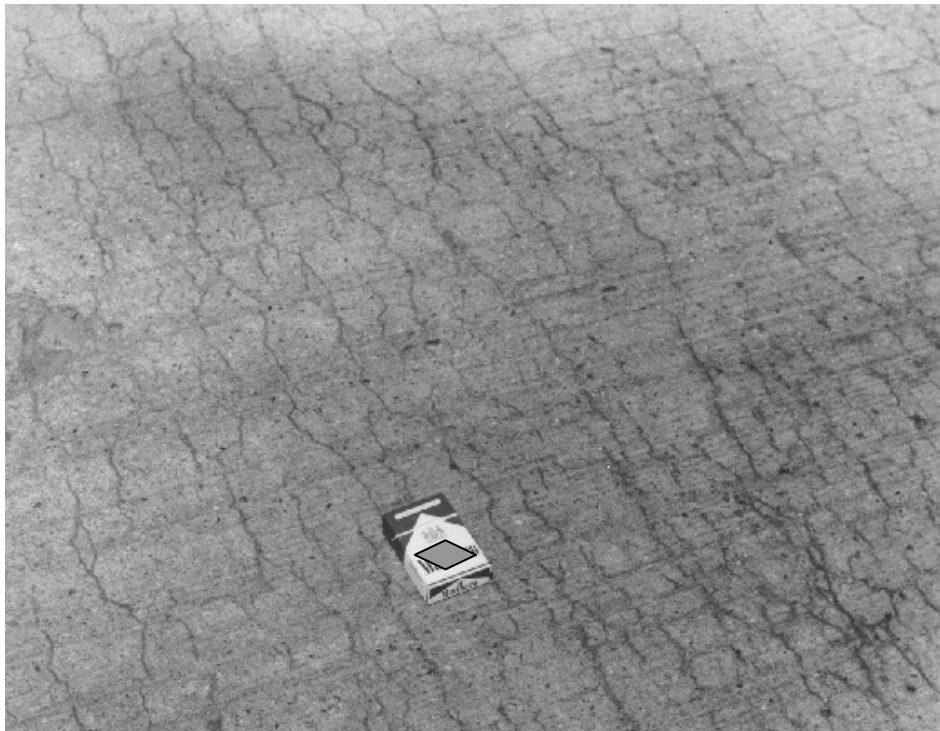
Typical destructive ASR in plain or lightly reinforced pavement.
